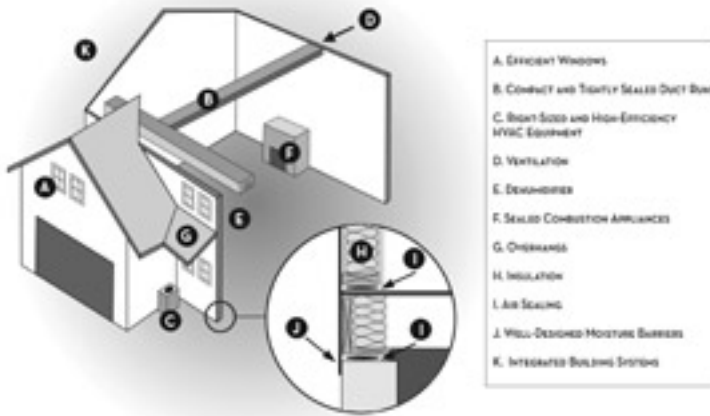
Elements of building science. Adapted from US Department of Energy's *Building America Best Practice Series, Volume 1
